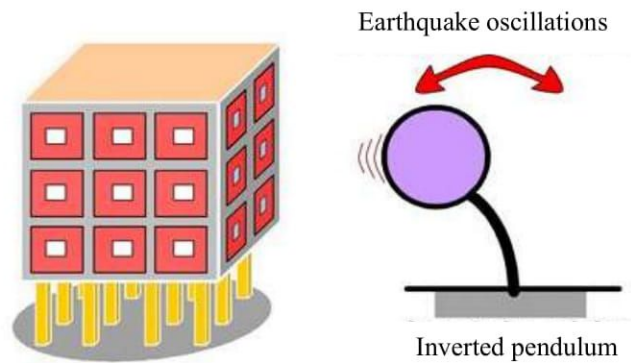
Soft story building acting as an inverted pendulum (Haque, 2007)
